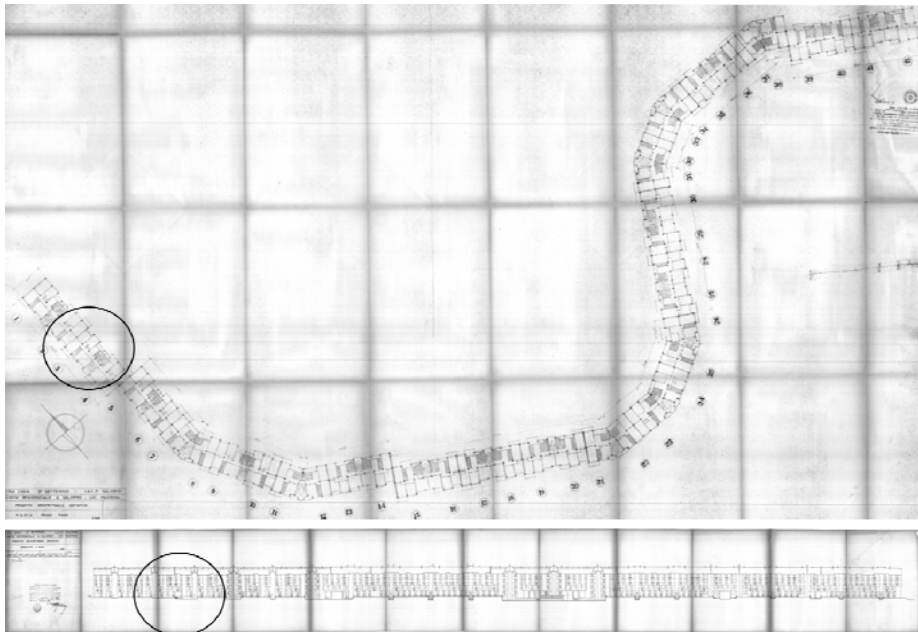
7: Building A, Quartiere Pastena, Plan and front.
